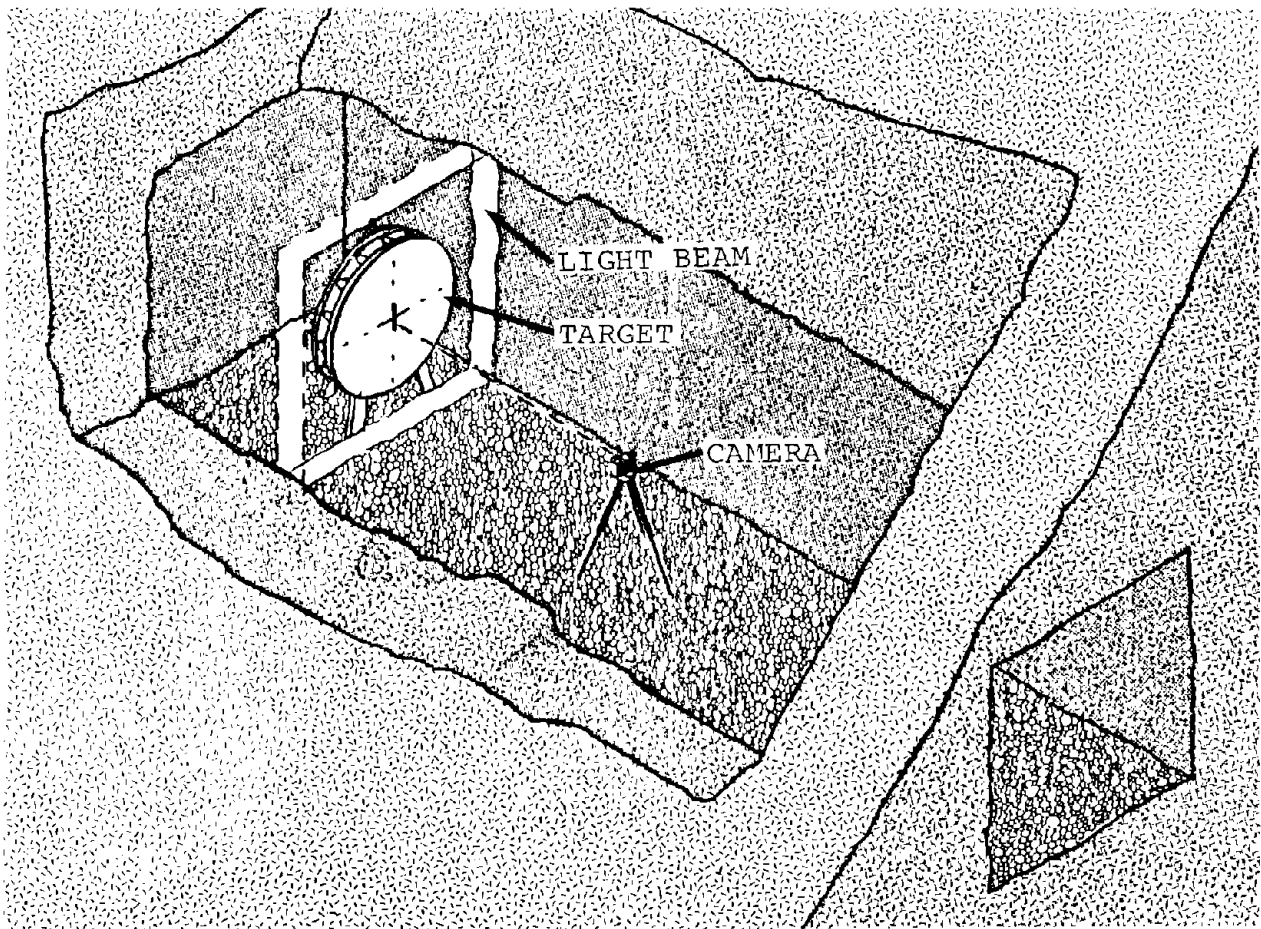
SCHEMATIC DRAWING OF TUNNEL SILHOUETTE PHOTOGRAPHIC TECHNIQUE
